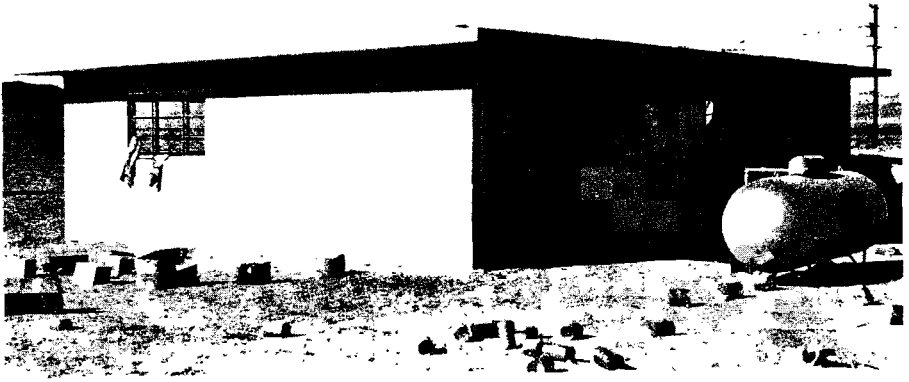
Reinforced precast concrete house after a nuclear explosion (5 psi peak overpressure). The LP-gas tank, sheltered by the house, is essentially undamaged.
